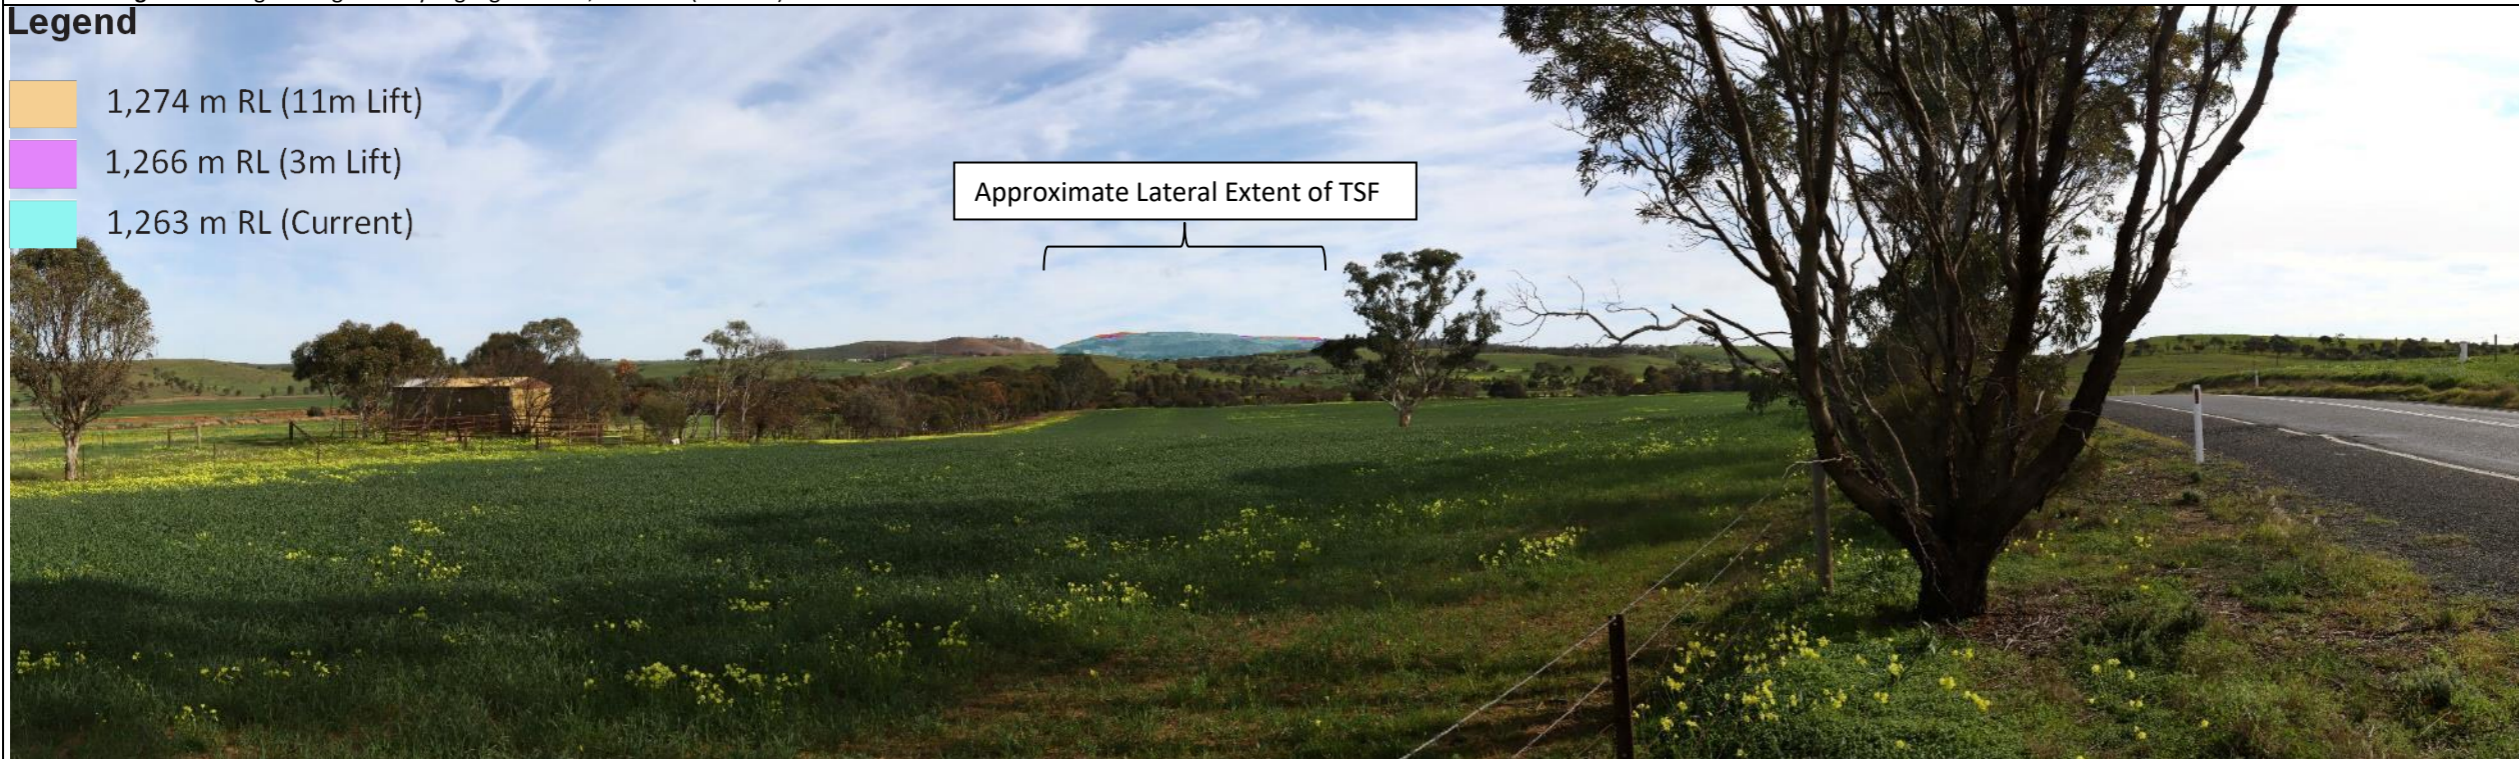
A: Tailings Storage Facility at 1,274 m RL (11m Lift)
